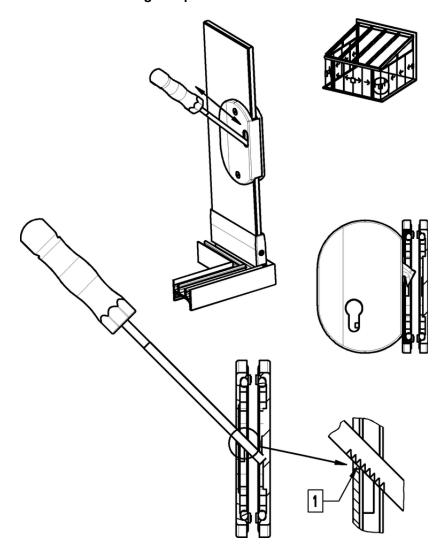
Adjusting the lockcase with hung bolt plus the latch bolt on 90° corner units - filing point
